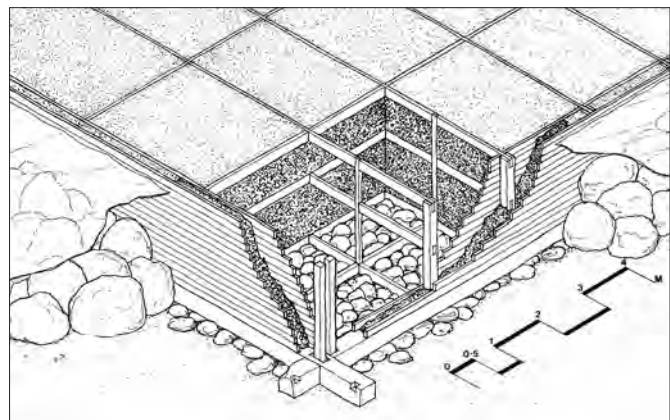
Reconstruction of double-walled floating caisson in Area G at Sebastos (C. J. Brandon after S. Talaat).
